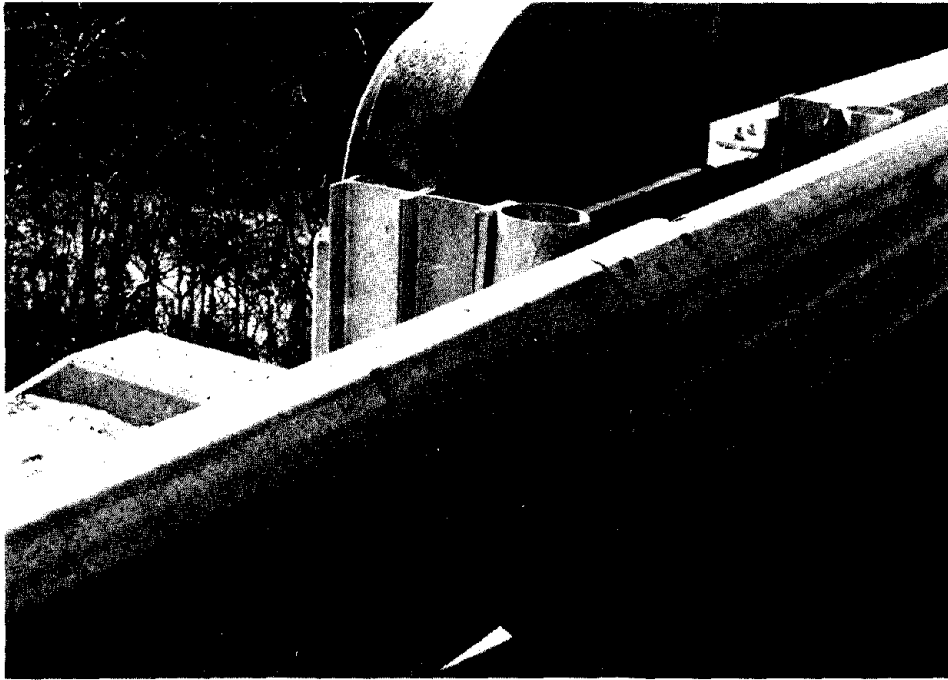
Connection between retrofit bridge railing and SERB guardrail.
